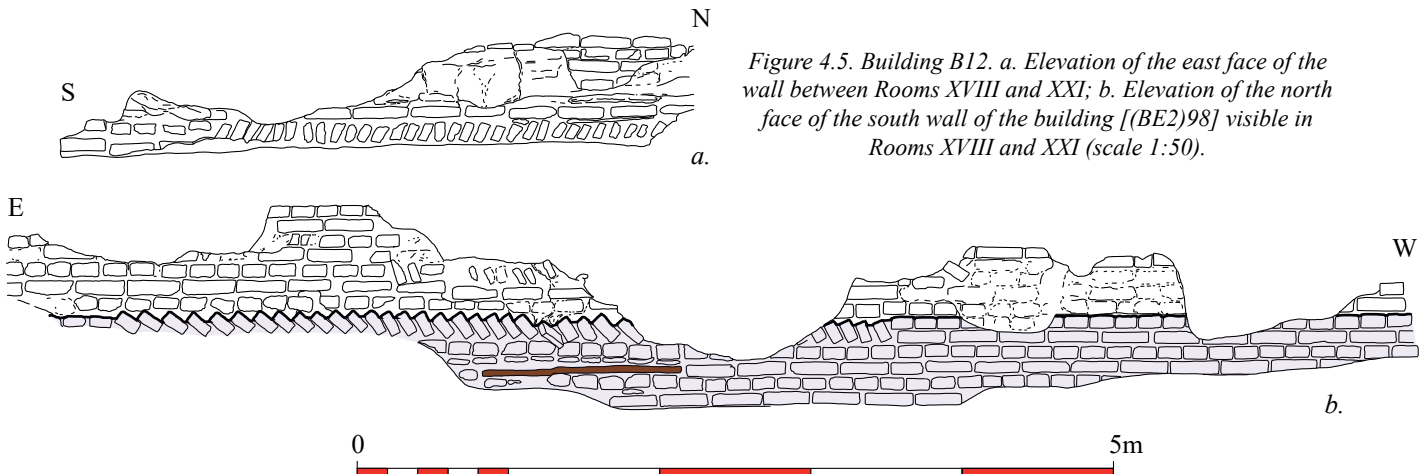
Building B12. a. Elevation of the east face of the wall between Rooms XVIII and XXI; b. Elevation of the north face of the south wall of the building [(BE2)98] visible in Rooms XVIII and XXI (scale 1:50).
